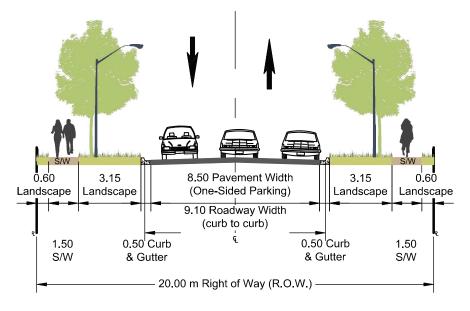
Conceptual cross section for 20.0m Local Road
